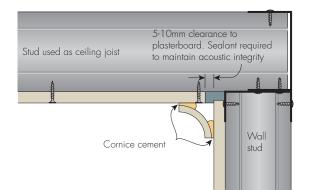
Non-Trafficable Ceiling to Plasterboard Wall
